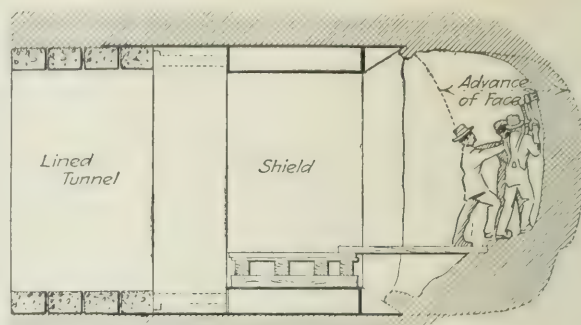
PROCEDURE IN EXCAVATING AT TUNNEL FACE
